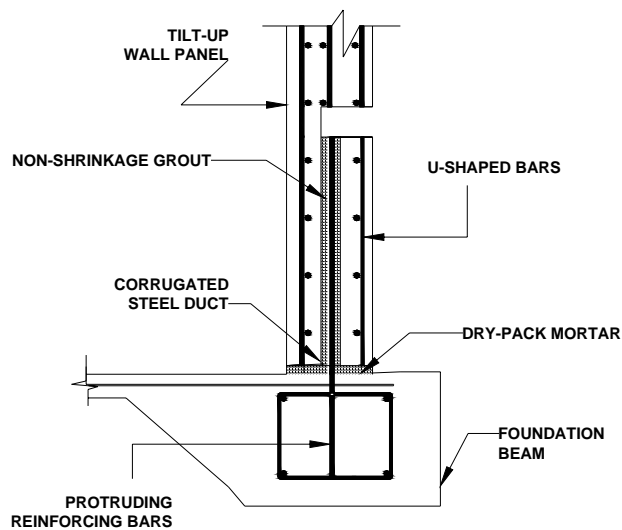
The typical connection between tilt-up wall and foundation beam (Liyanage, 2004).
